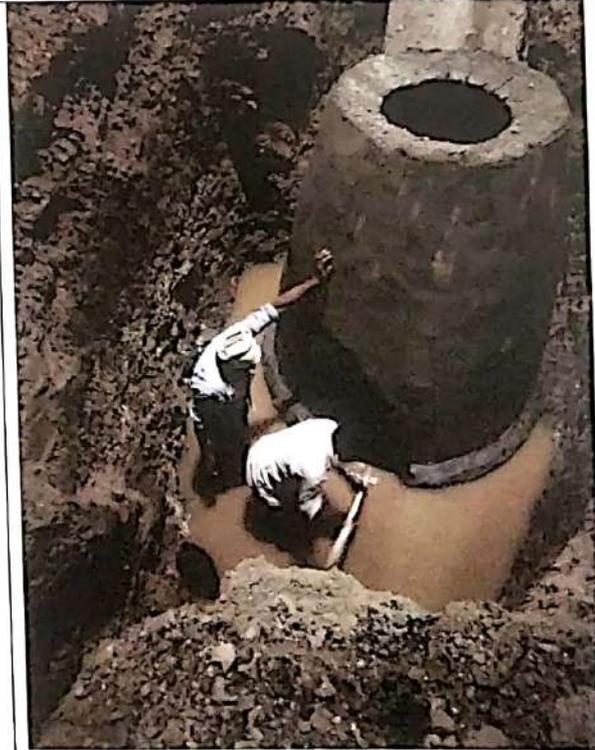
Execution of RCC manhole for sewer pipeline in Lakhpati Galli area
